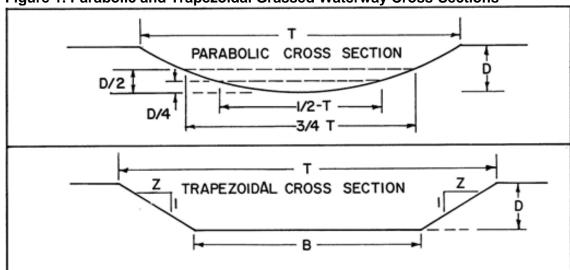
Parabolic and Trapezoidal Grassed Waterway Cross-Sections
